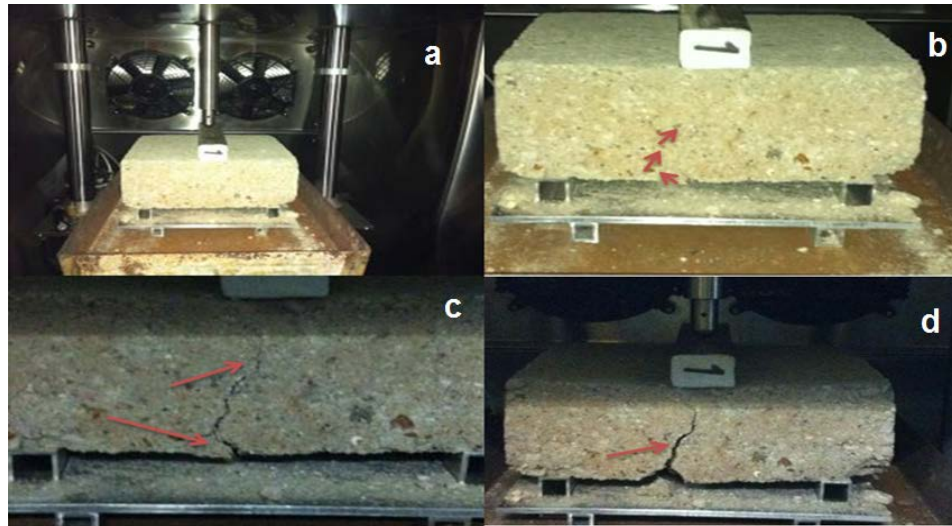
Modified bending beam test of beam 2 with support beam. (a) The first step of applying loads (b) Increase of microcracks with rise of applying loads (c) Increased cracks in the middle of beam (d) Failure of RCC beam
